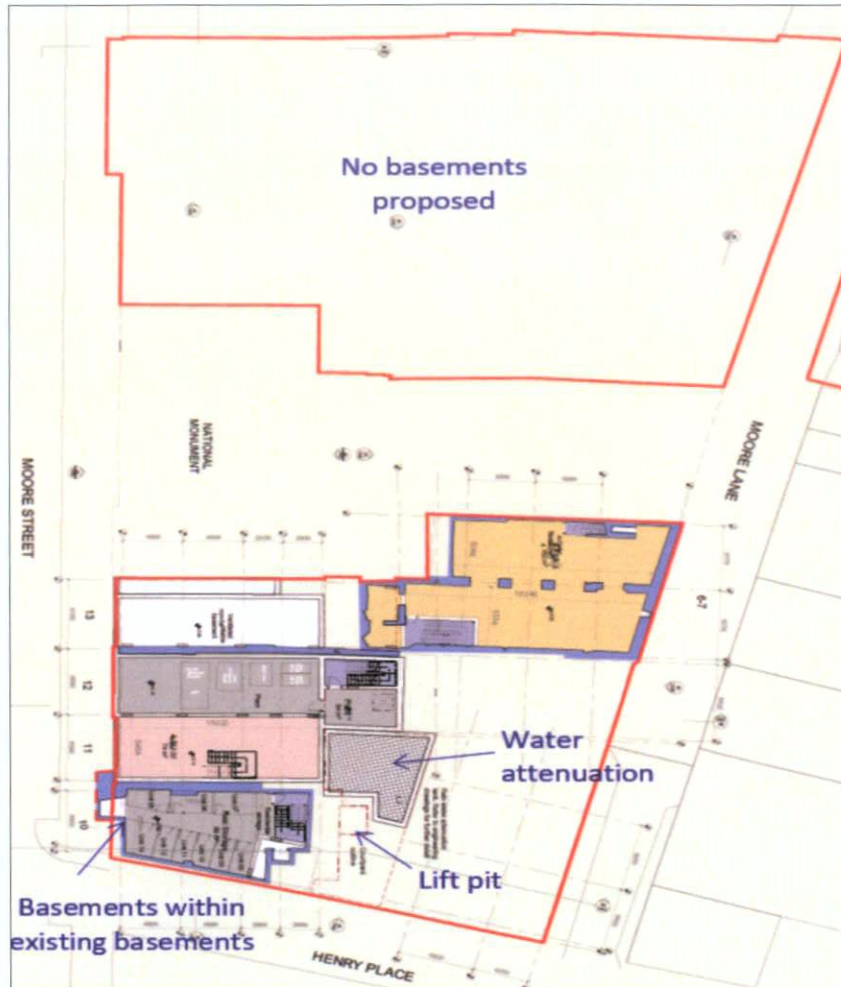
Site 4, proposed basement slabs, walls and columns (blue shows existing fabric).
